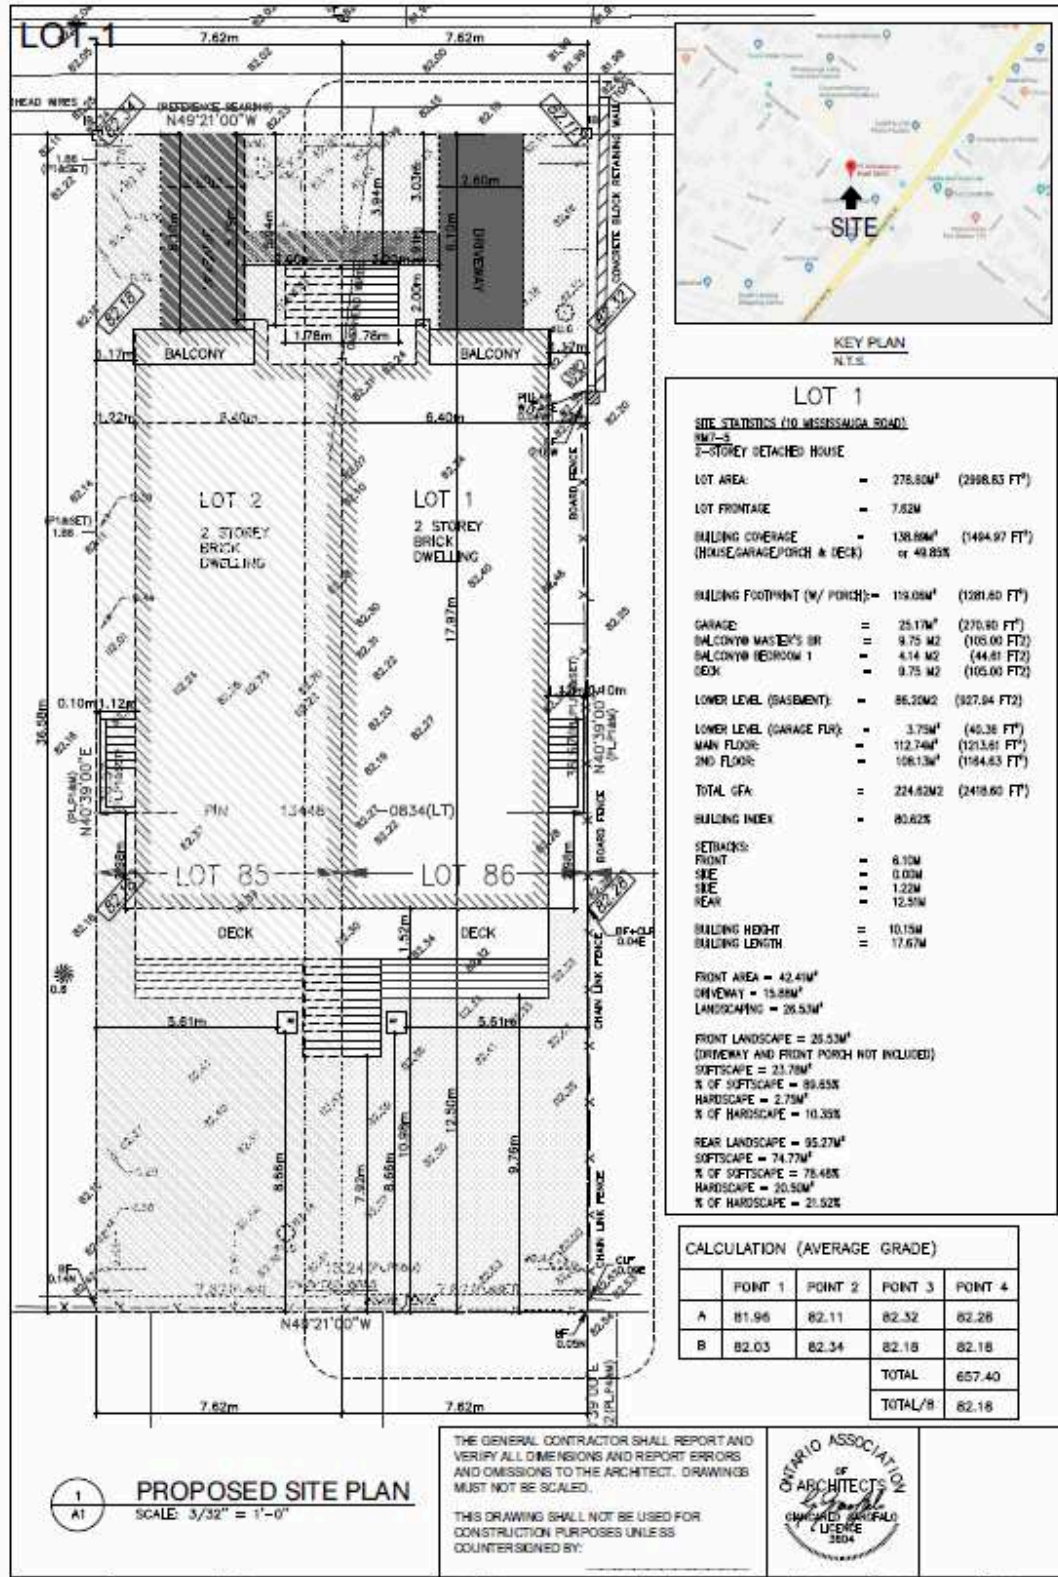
The proposed site plan of 10 Mississauga Road North. (Image from owner.)
